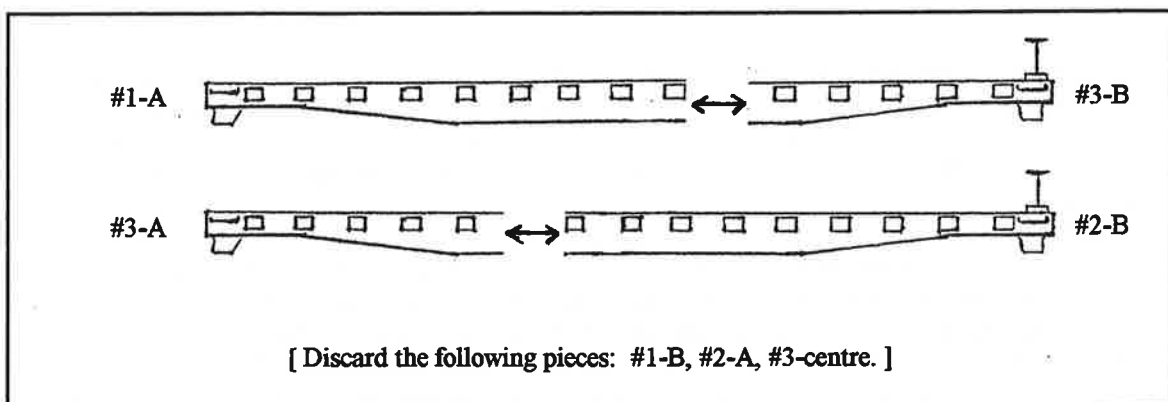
After making your cuts, rearrange the parts as shown above and discard those which are not required.
